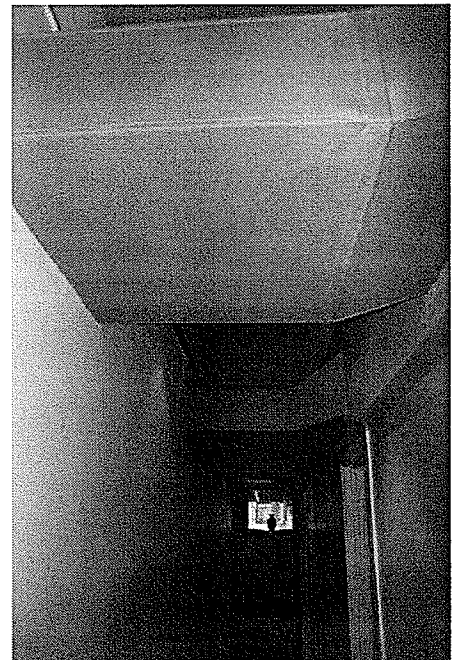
Main ducts protruding from interior walls built around washrooms on the lower level.
